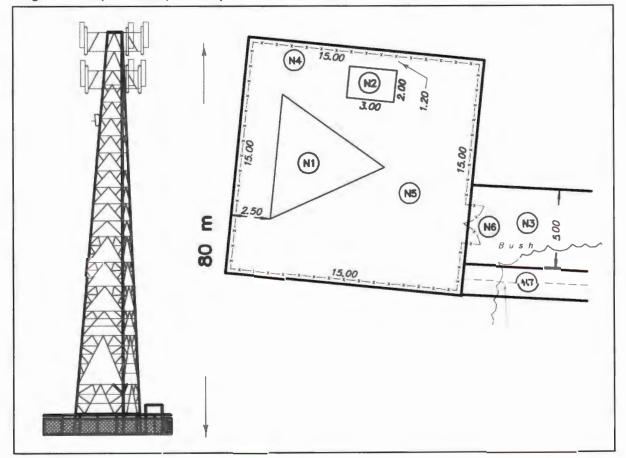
Proposed Compound Layout Plan & Tower Elevation Plan
